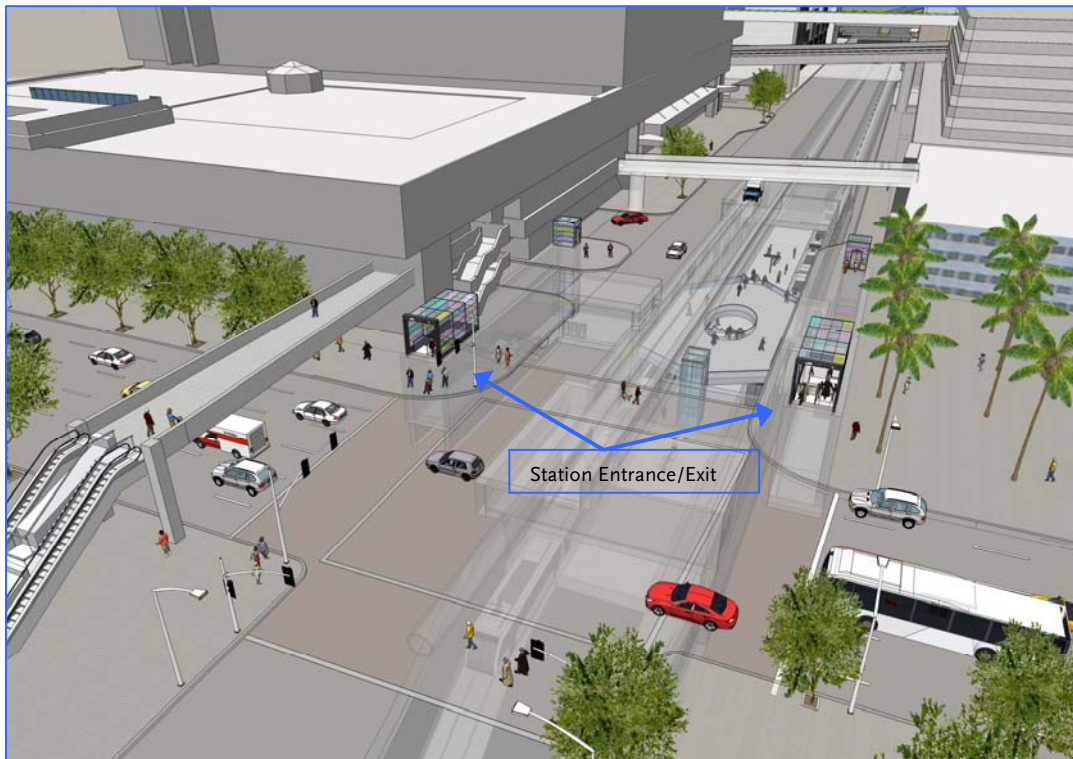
Underground Emphasis LRT Alternative – Intersection of Flower and 5th Streets Looking Northwest
